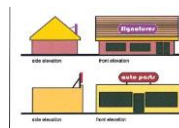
The top image would be permitted as a roof sign that does not extend above the highest point of the roof. The bottom image would not be permitted as the sign extends above the highest point of the roof.
